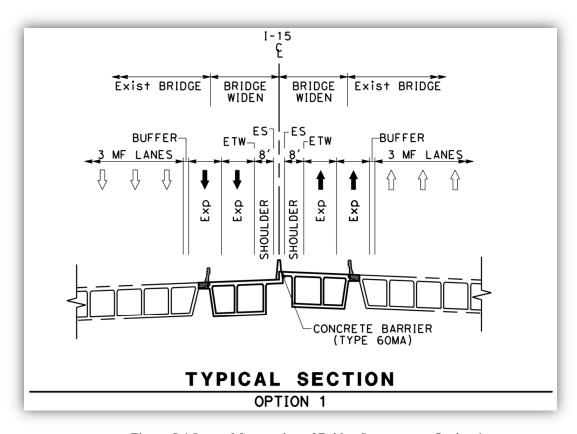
Lateral Separation of Bridge Structures - Option 1
